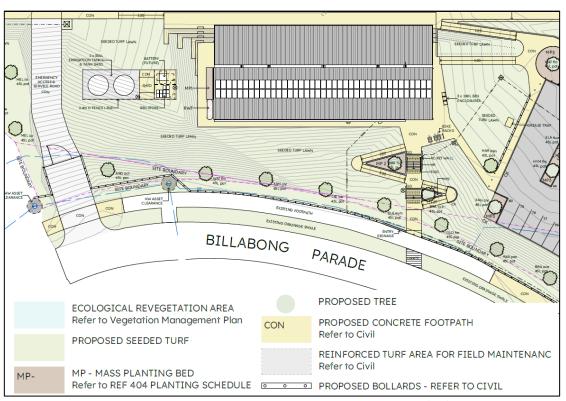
Site Plan west side Extracted from Attachment 1 (Source: Council, 31/07/2025)
